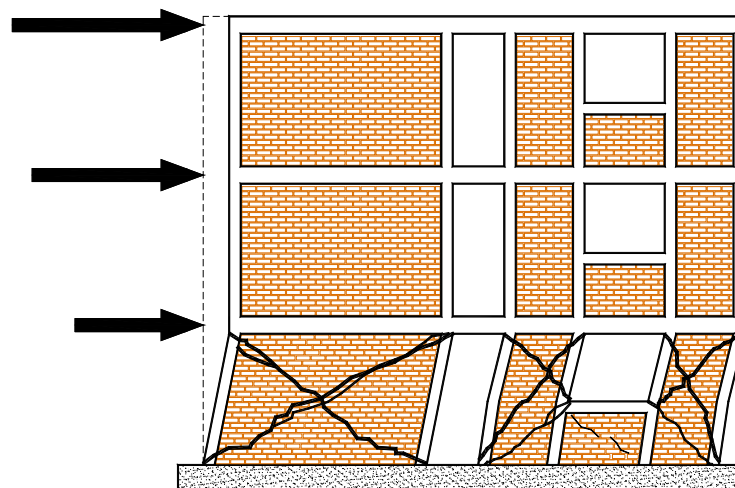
Collapse mechanism for multi-story confined masonry buildings (Alcocer et al., 2004).
